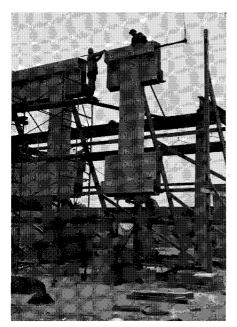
Precast I segment being spliced to adjoining truss in precaster's yard.
